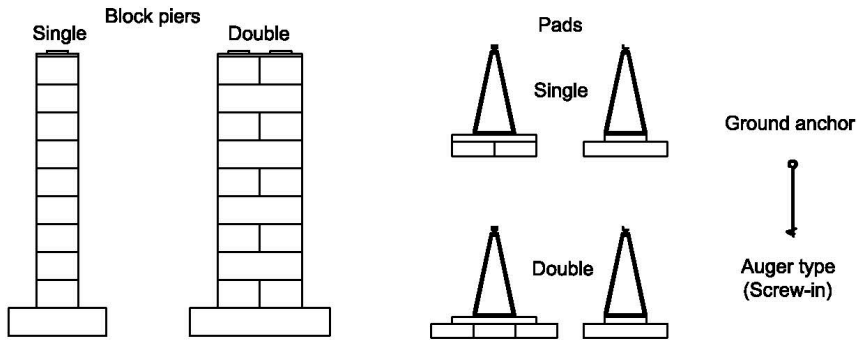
Footing systems using single or double block piers or pads with ground anchors.
